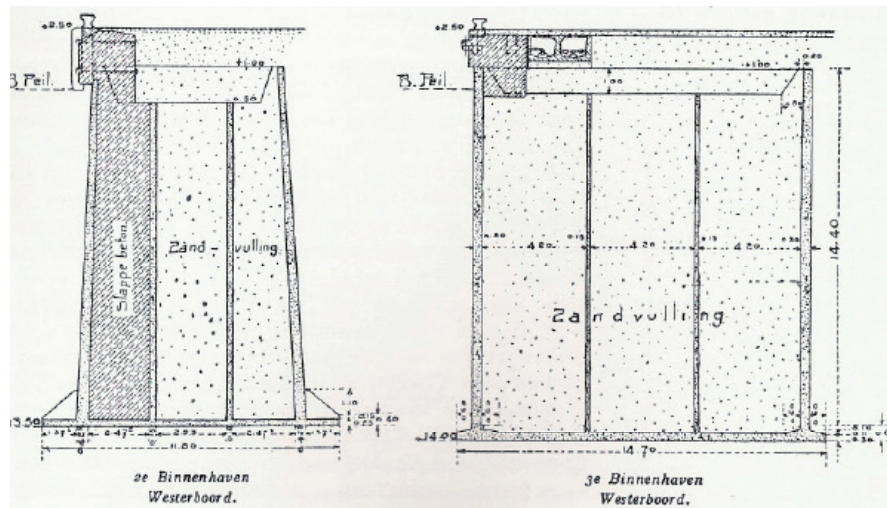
Cross-section of caisson type quay walls installed in Tantjong Priok [HBG 1977]
